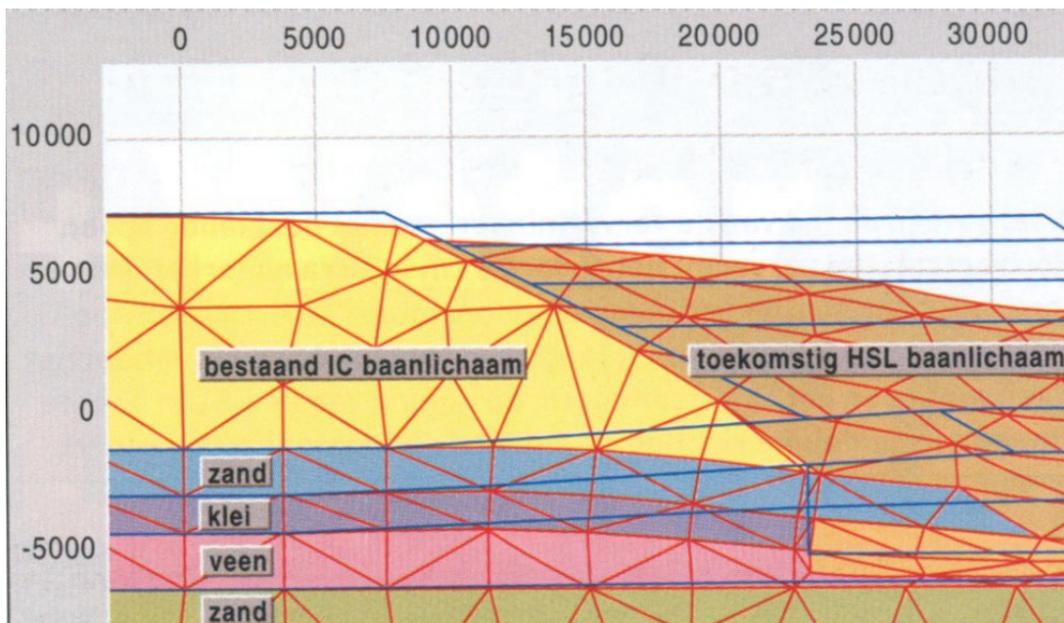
Due to the construction of the future HS-Railway embankment (on the right) are deformations occurring of the existing railway embankment (on the left). With the finite element program Plaxis the deformations of the two embankments in the final situation have been calculated. (from: Spierenburg and van der Velden, 2002).
